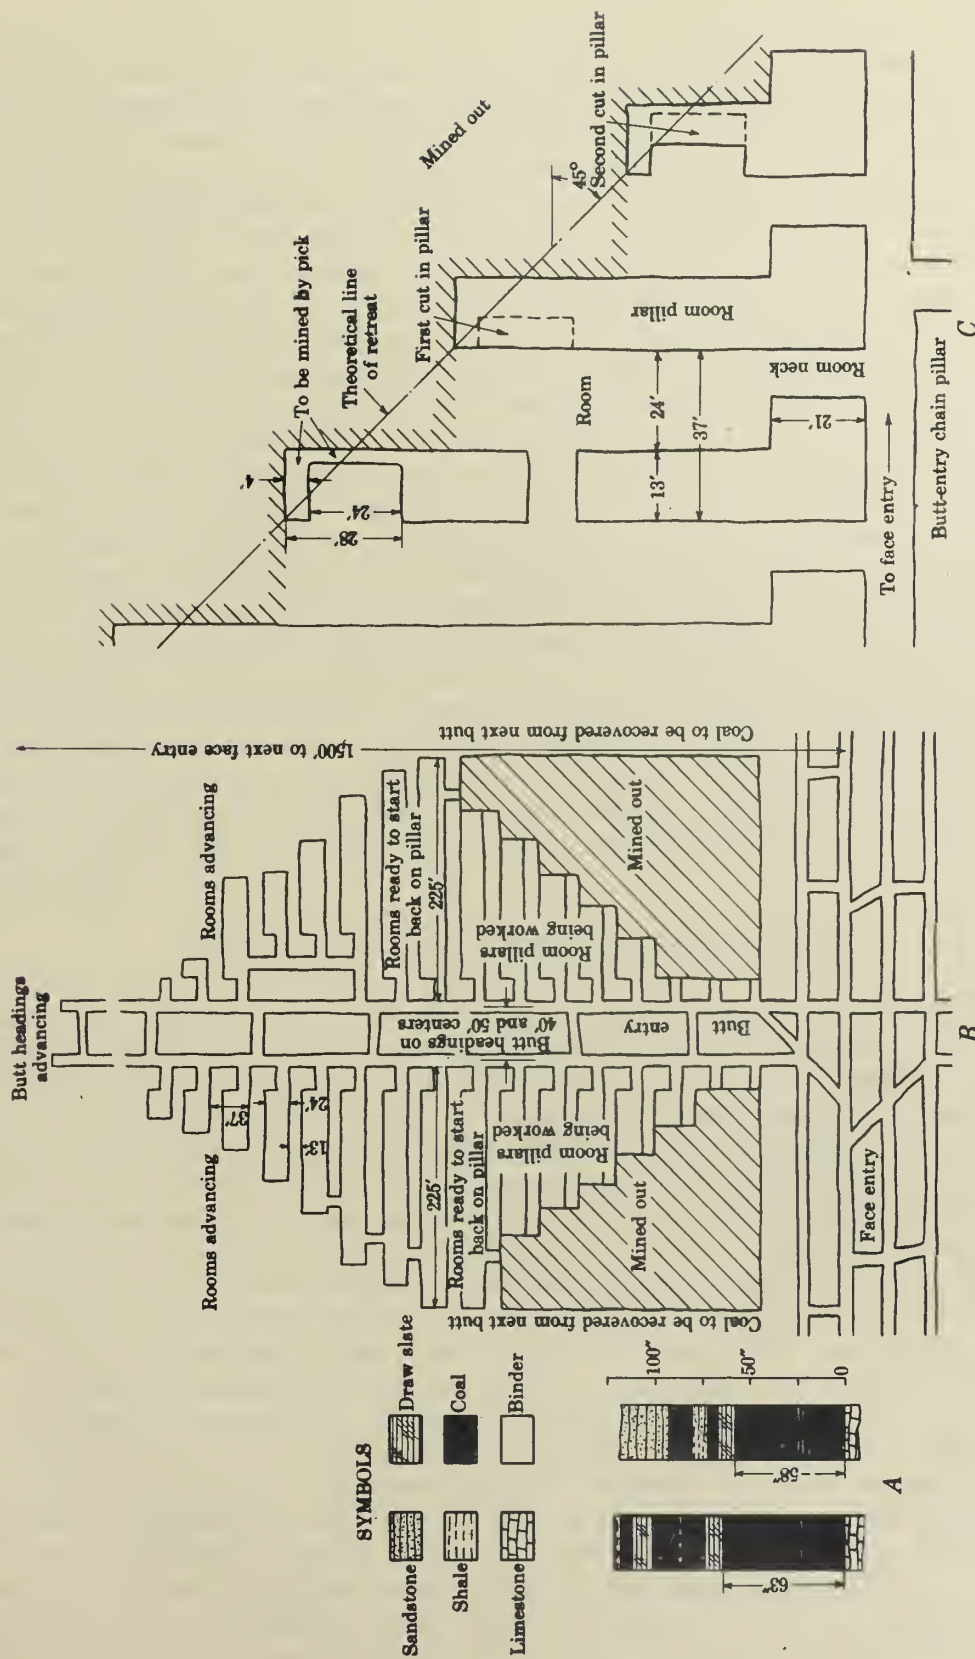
Coal and roof sections, plan of development, and pillar extraction used in the Panhandle district of Pennsylvania, type B mines: A, Sections of the coal bed and immediate roof typical of type B mines; B, method of development and pillar extraction on a butt entry; C, details of extraction of room pillars.
